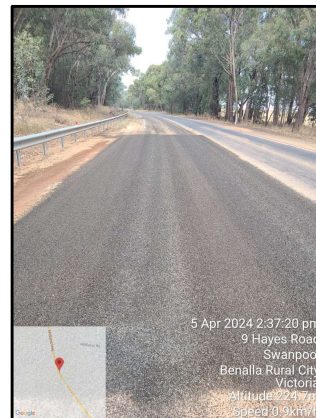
10/7mm Primerseal Completed on Stabilised Pavement
